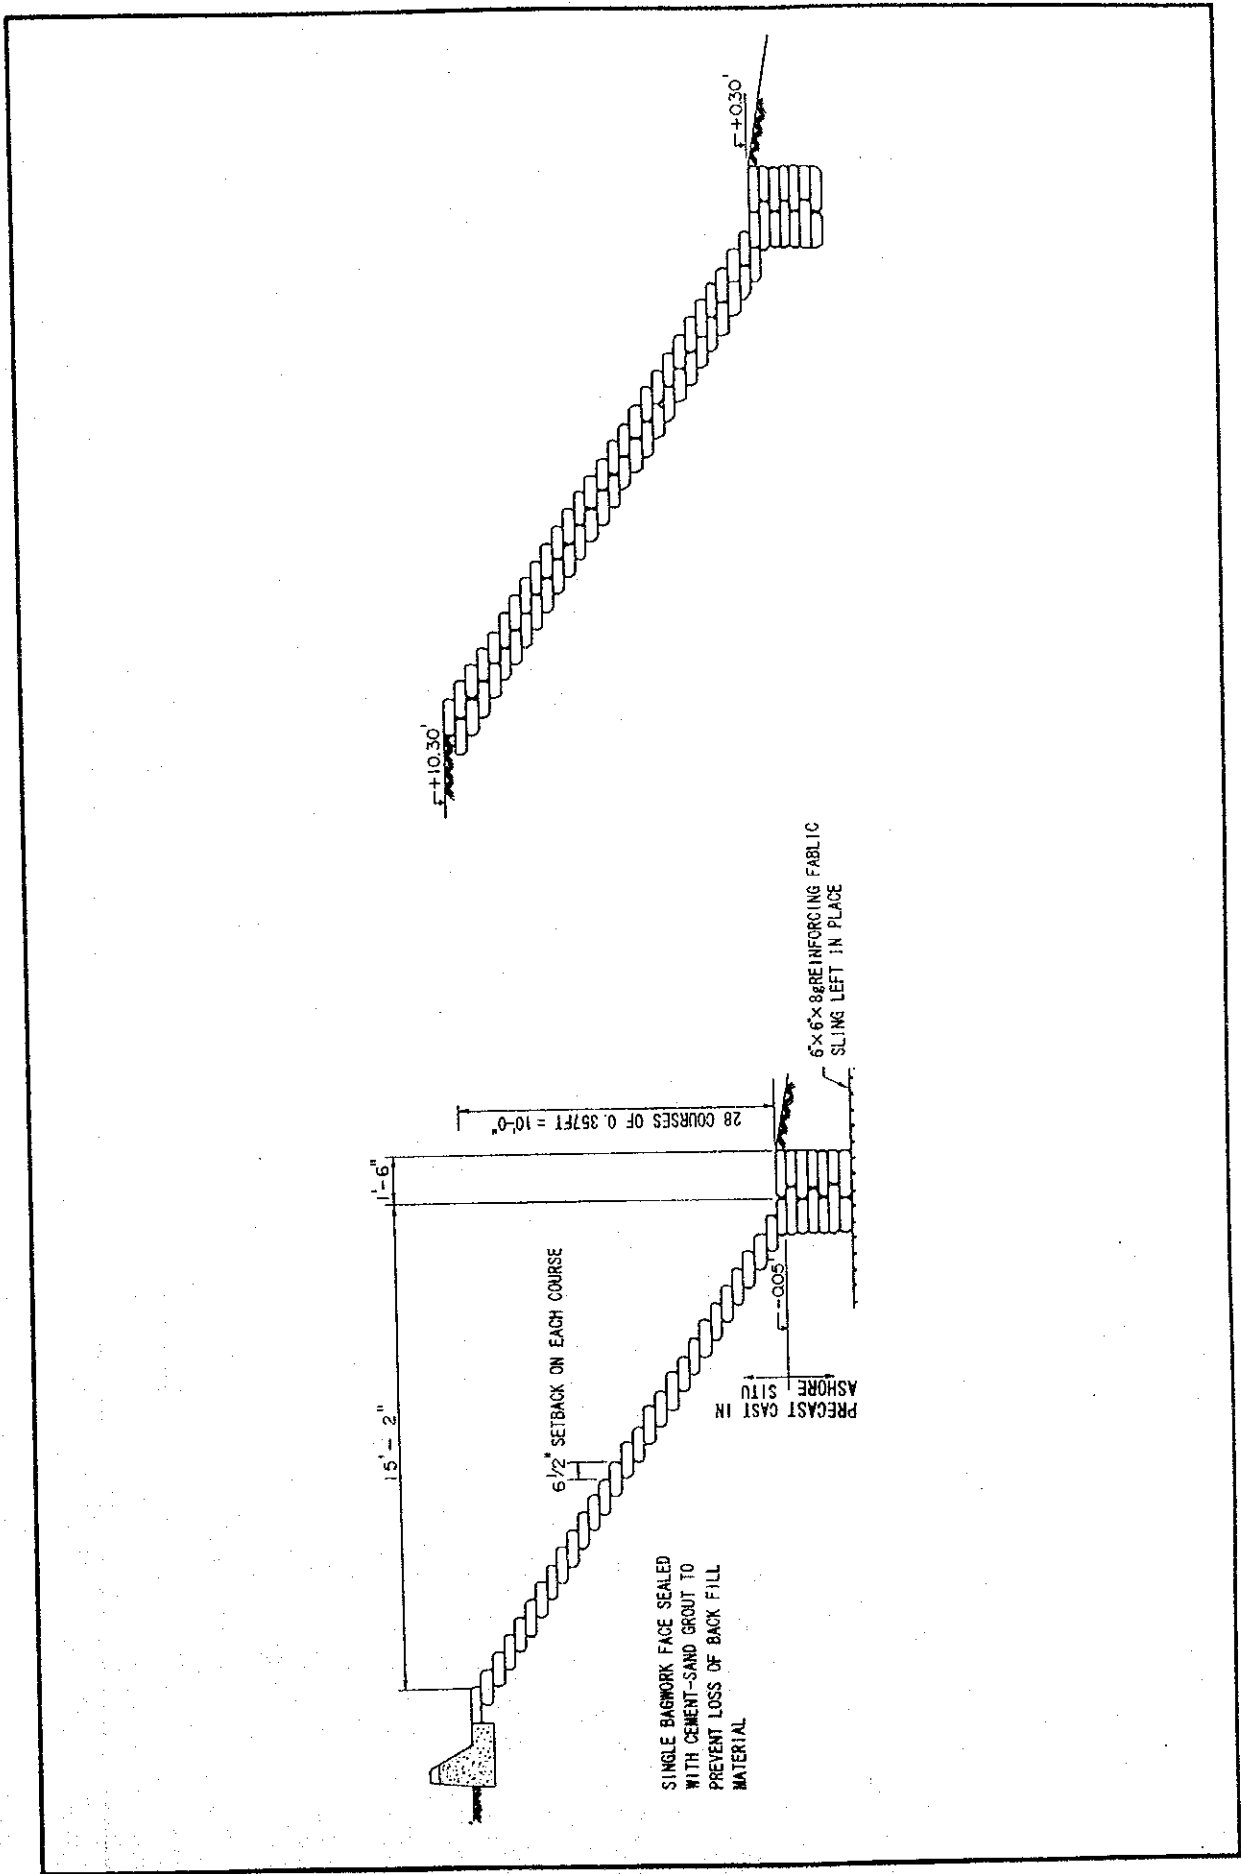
Typical Cross Section of Seawall (East & West Mole)
